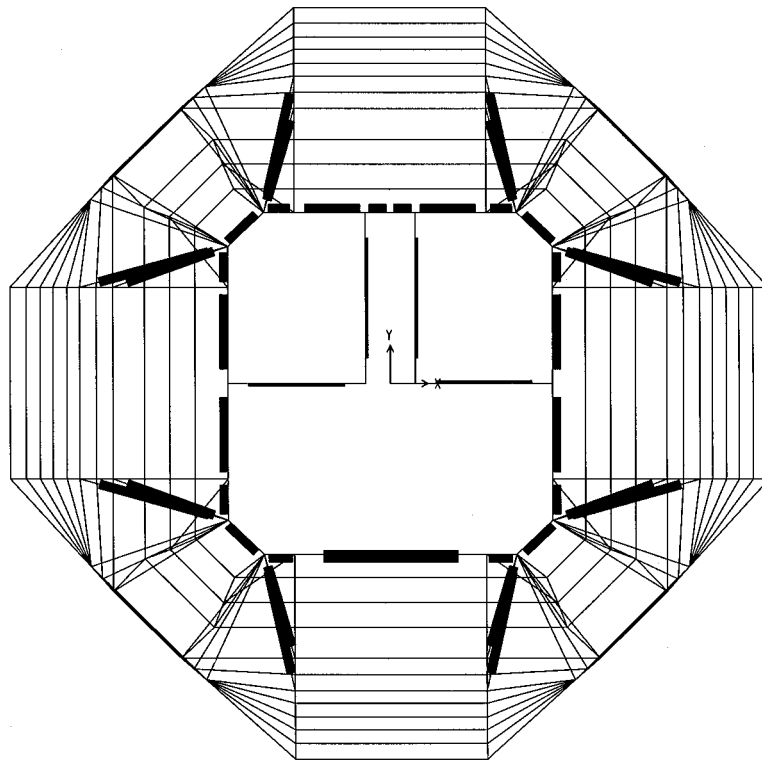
Plan view of FEM5 showing outriggers and thin internal walls.
